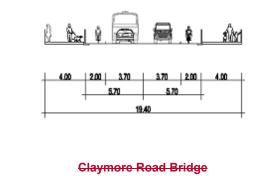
F Sub-arterial road type b claymore road bridge cross section
